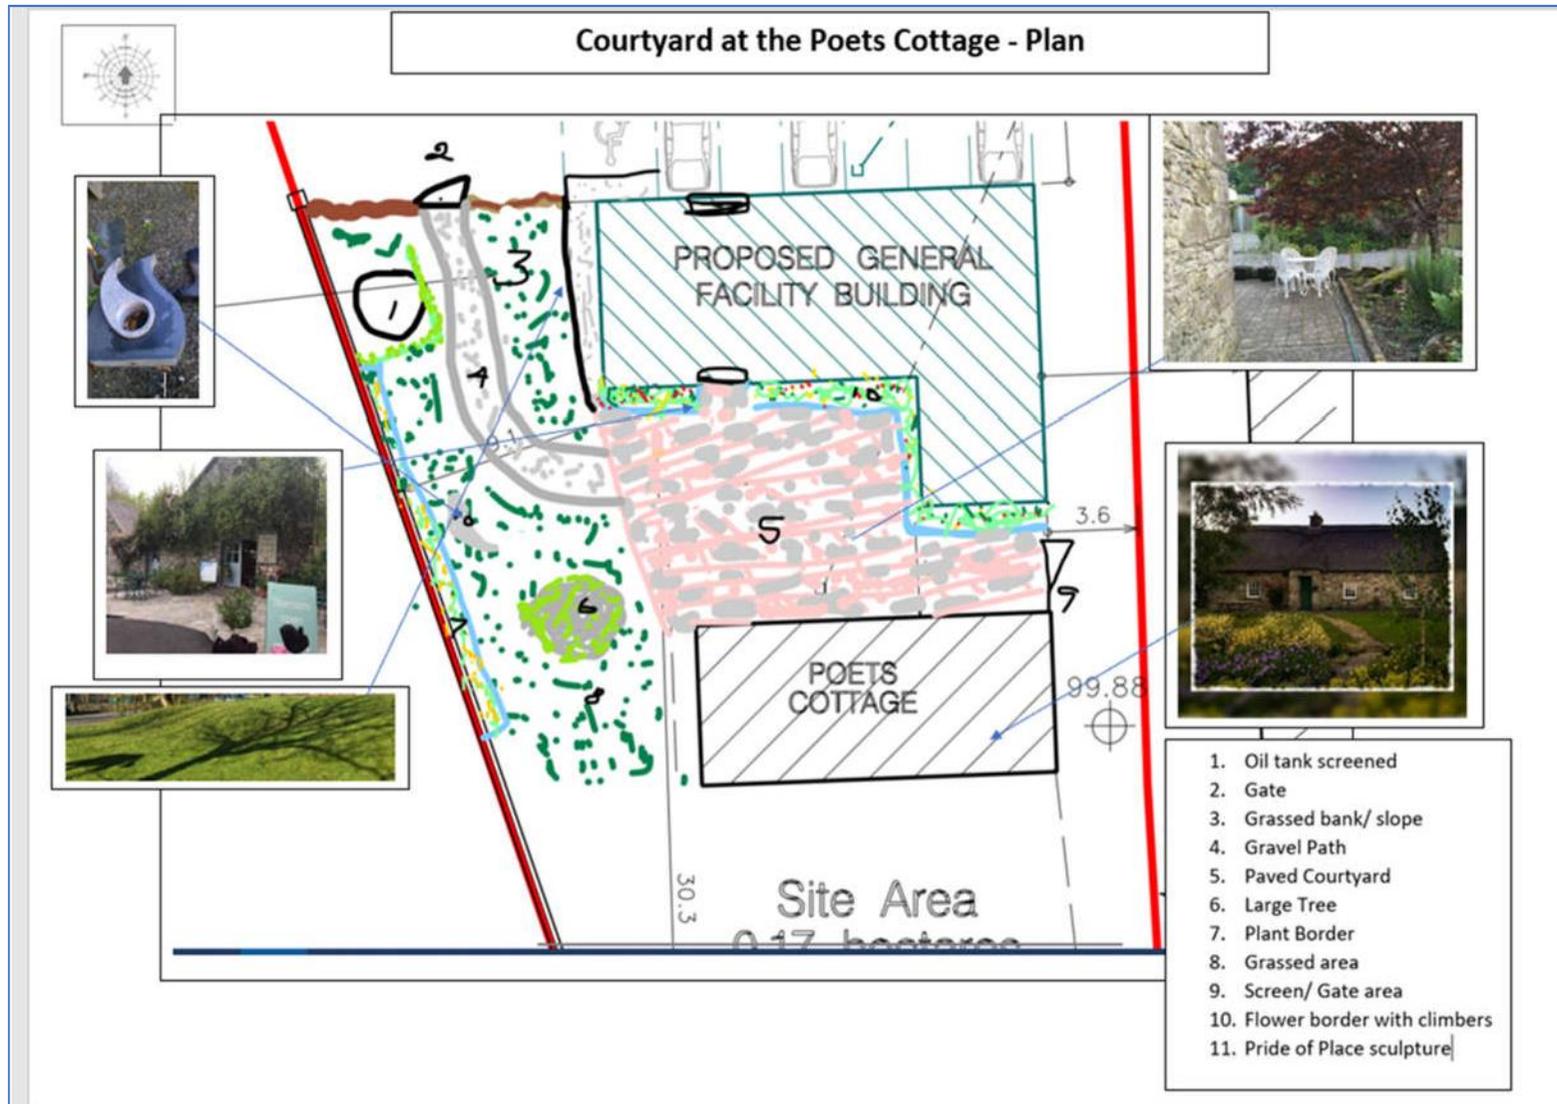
Poet's Cottage Courtyard – Plan for development of same
